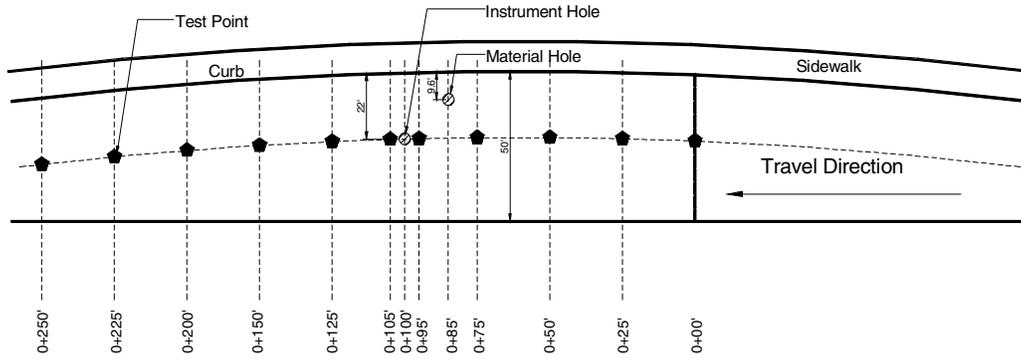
Layout of the test point, instrumentation and material holes for test section 3
